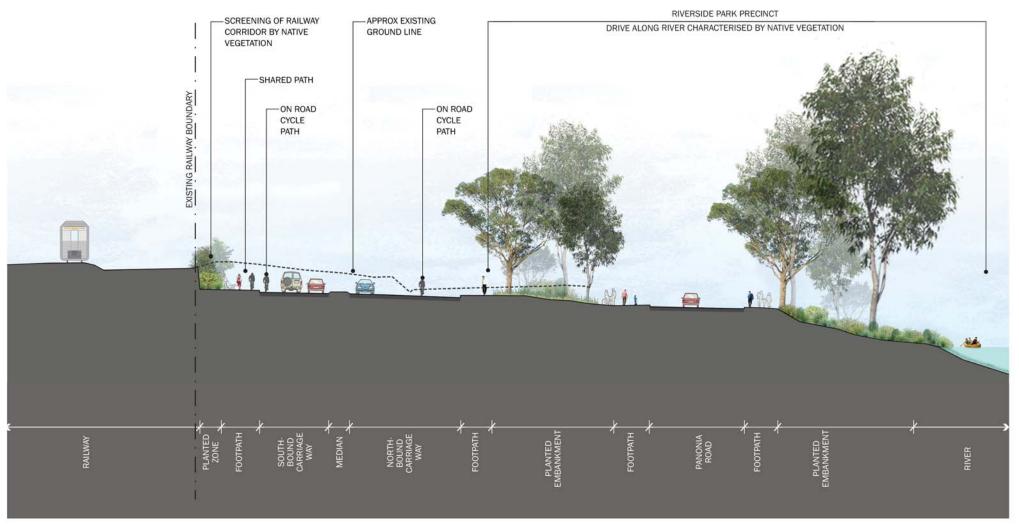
Proposed road cross section B at Ch.710 (Scale 1:400 @ A3)
